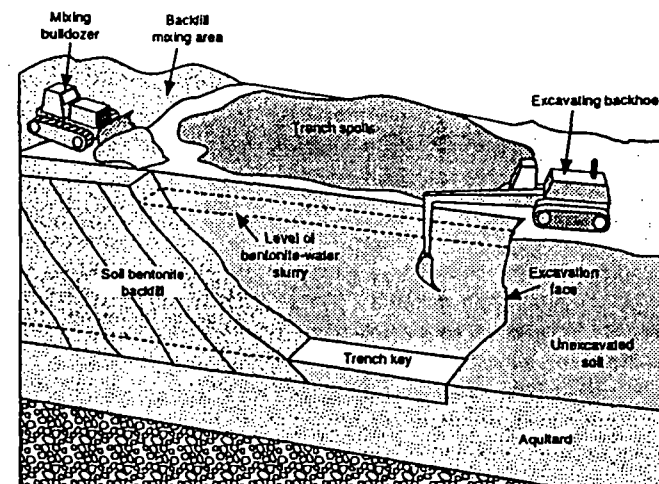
Construction of a Soil-Bentonite Slurry Trench Cutoff Wall (from LaGrega et al. 1994)
